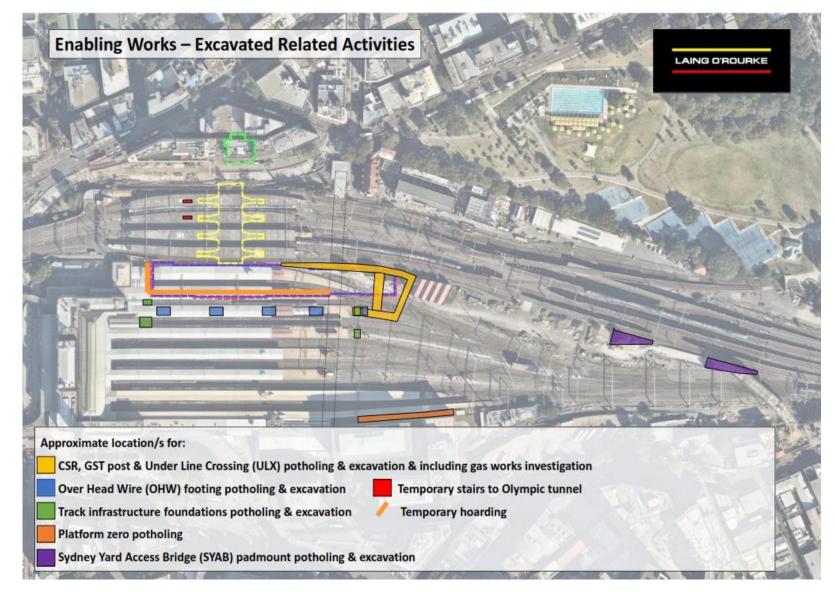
Plan of proposed excavation works (Source: Laing O'Rourke)
